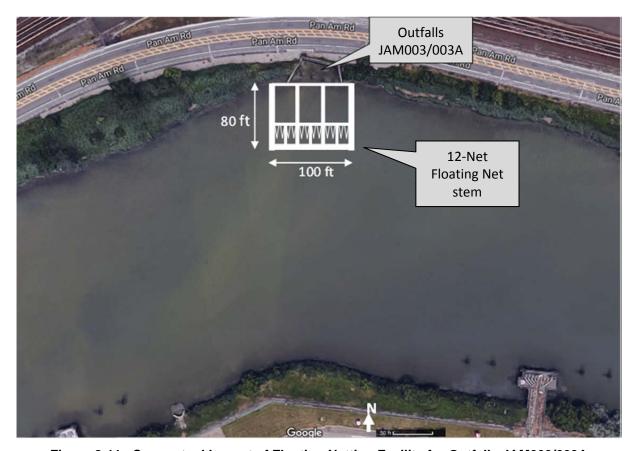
Conceptual Layout of Floating Netting Facility for Outfalls JAM003/003A
